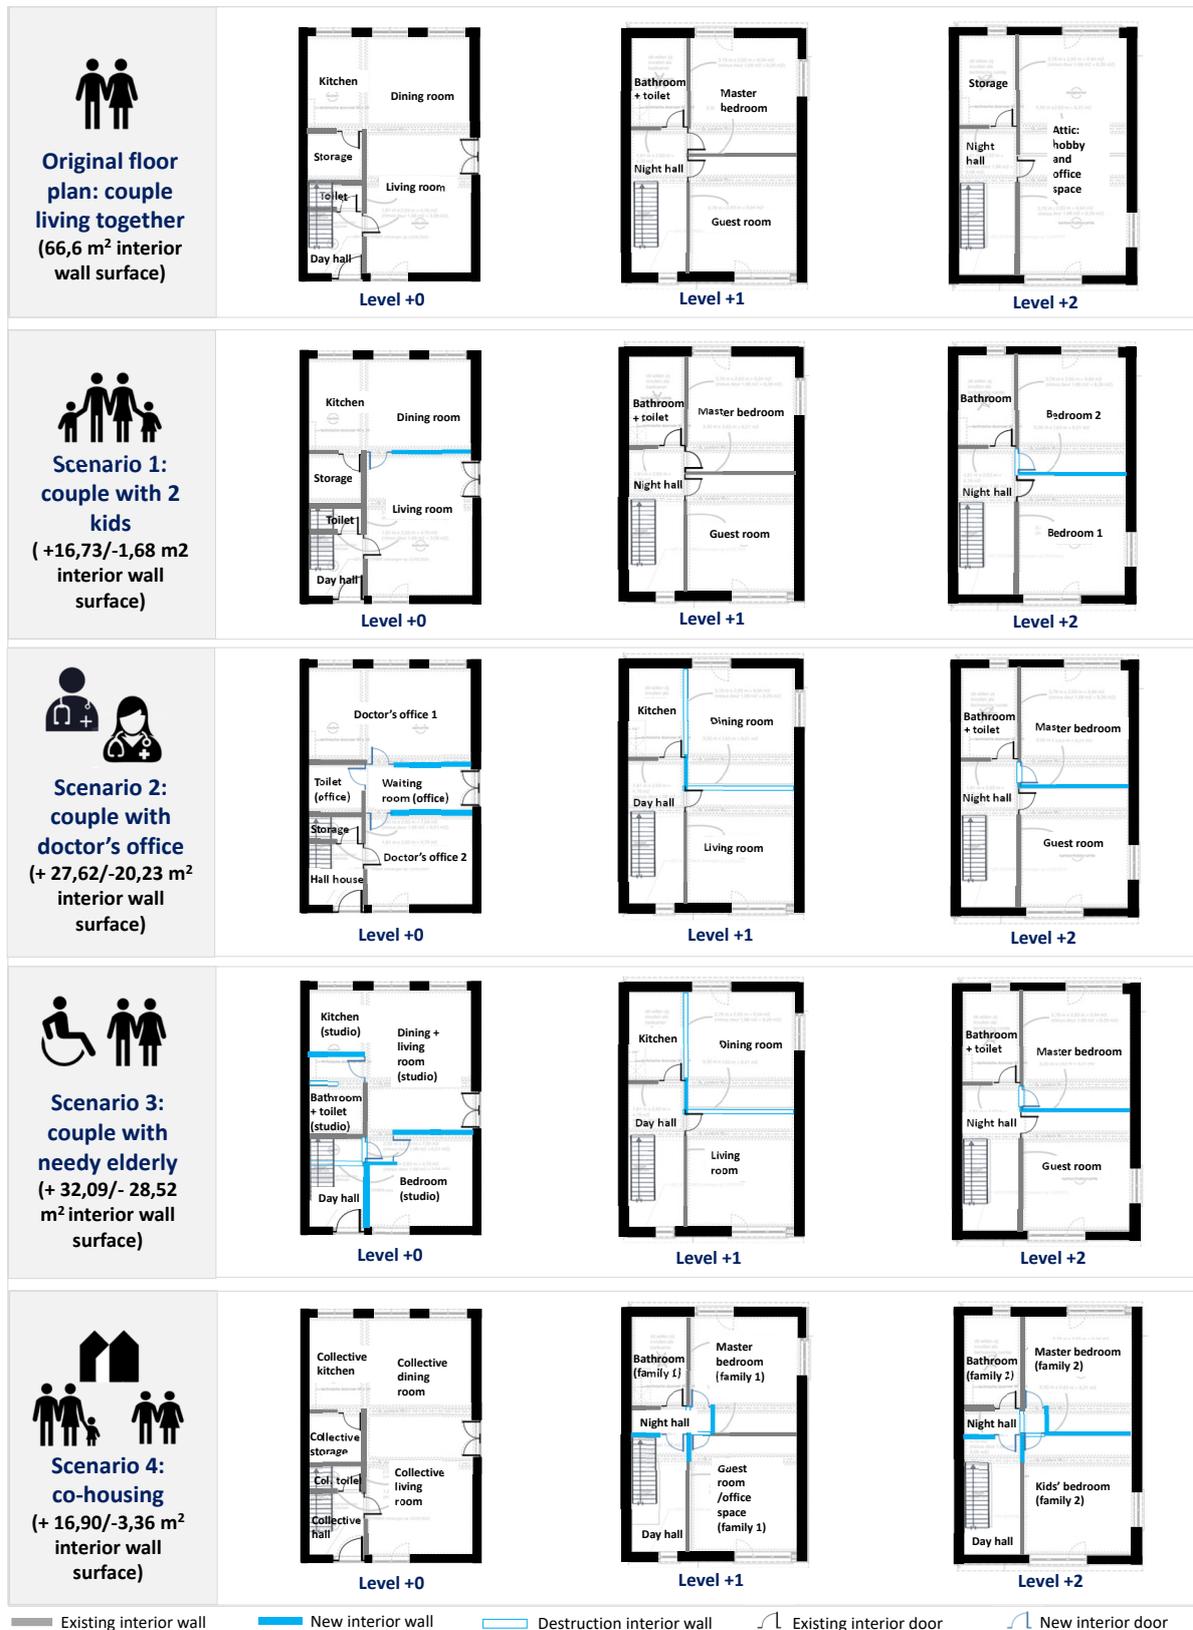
Overview of the original floor plan and the floor plans of the four refurbishment scenarios with the transformed walls.
